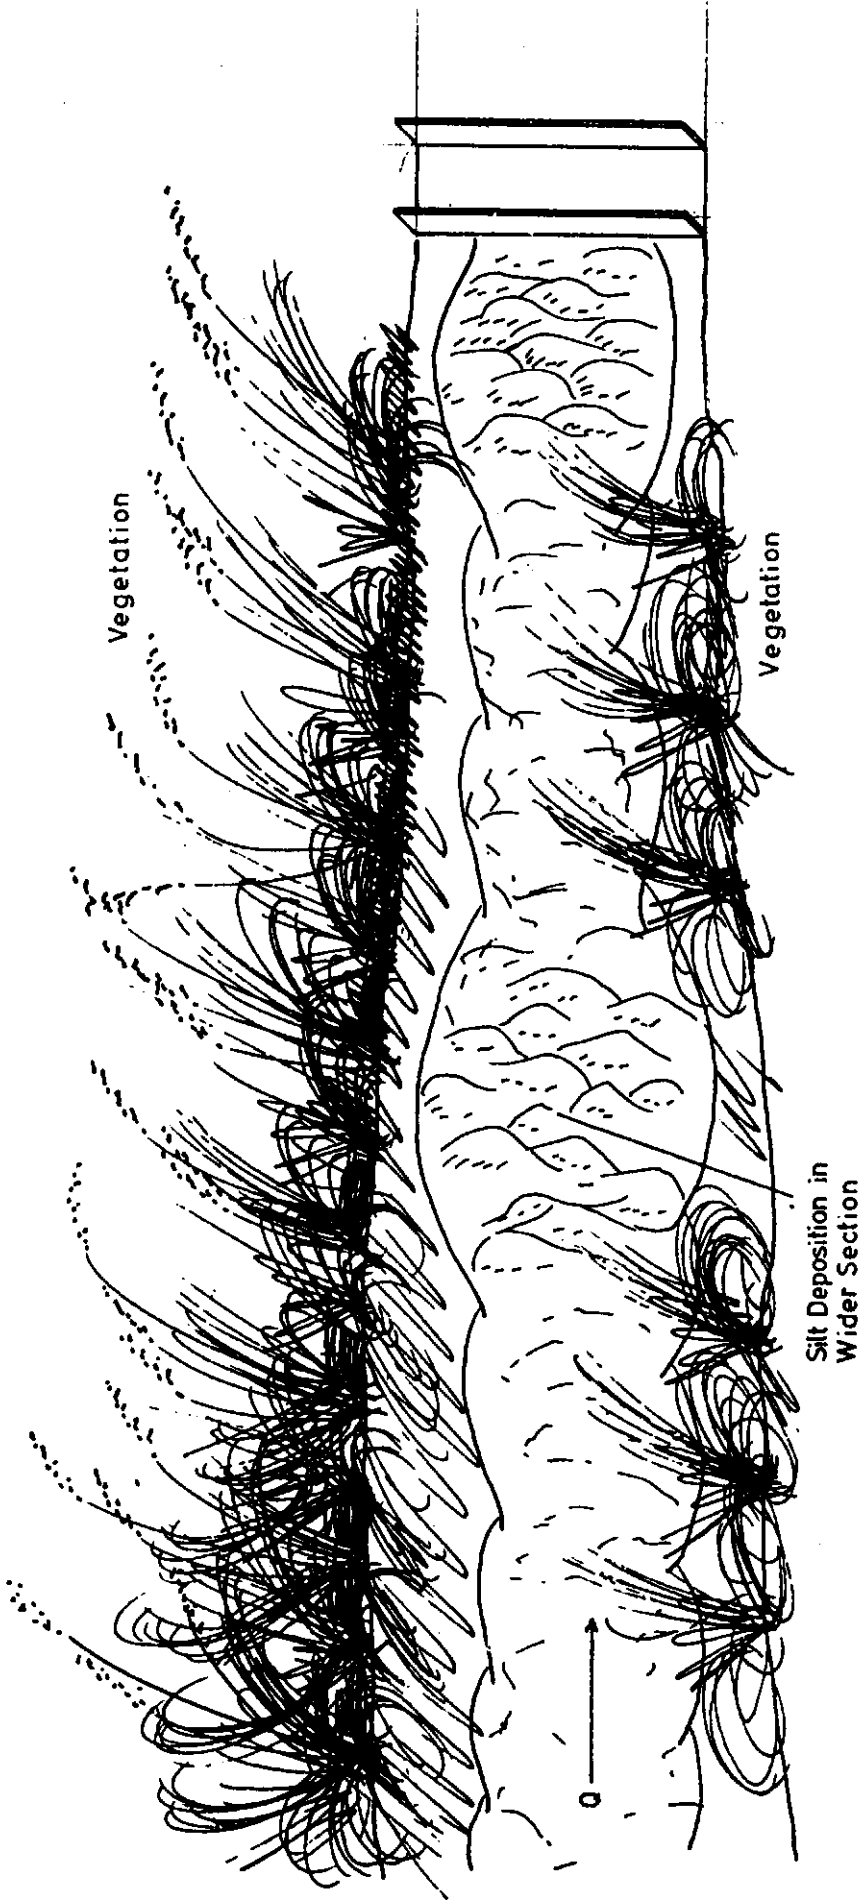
Sketch of Dhoro Naro Minor from RDs 24.4 to 27.526, showing vegetation growth and silt accumulation in wider sections.
